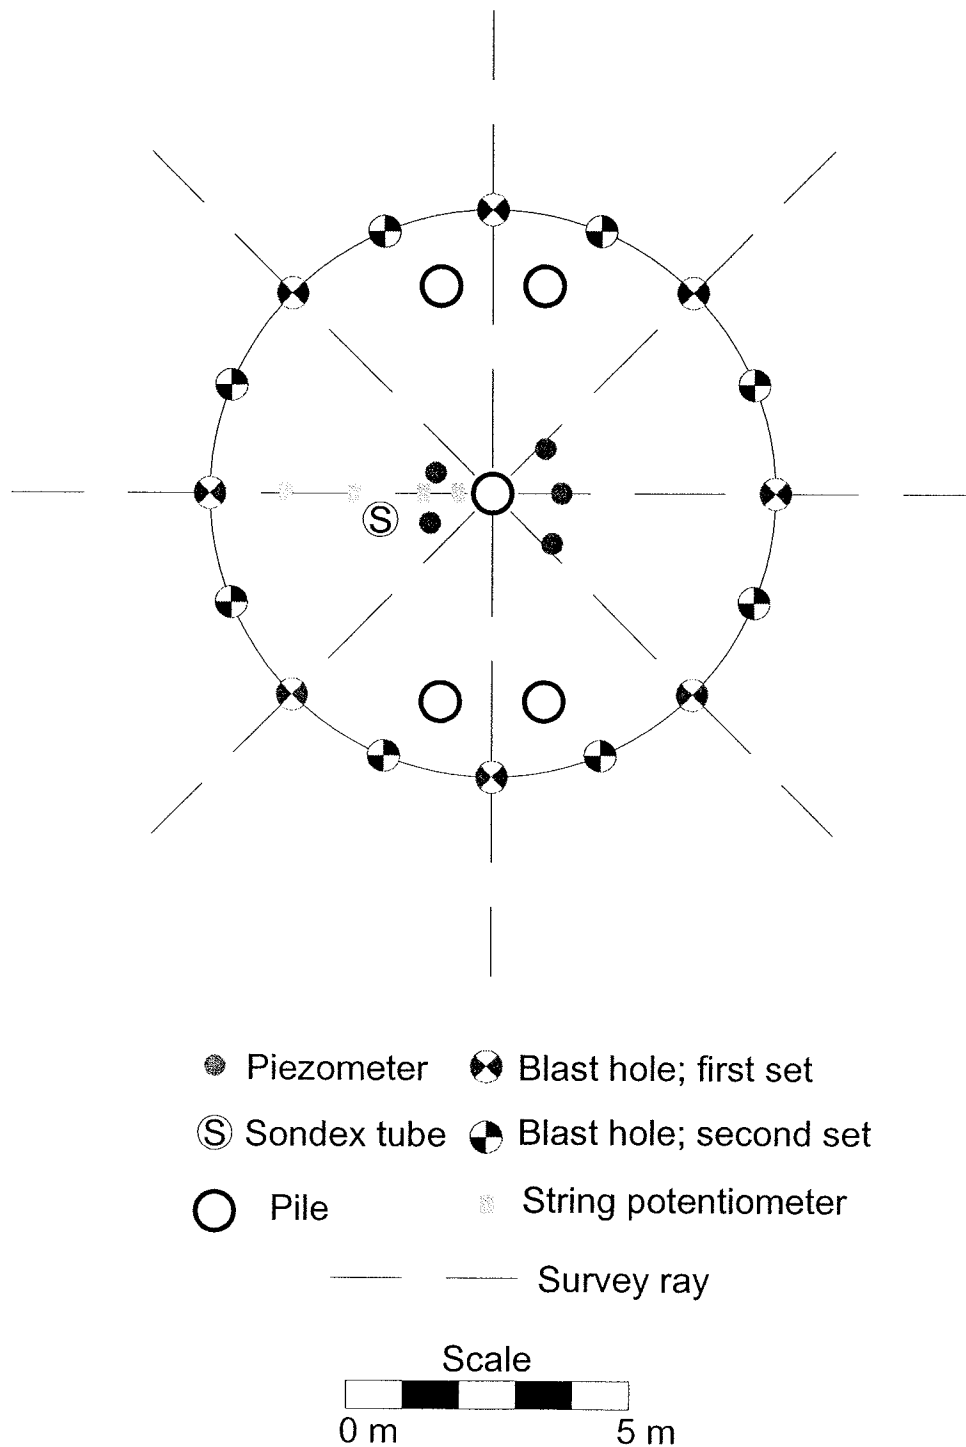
Plan view of pile foundation and instrument layout at Site 1.
